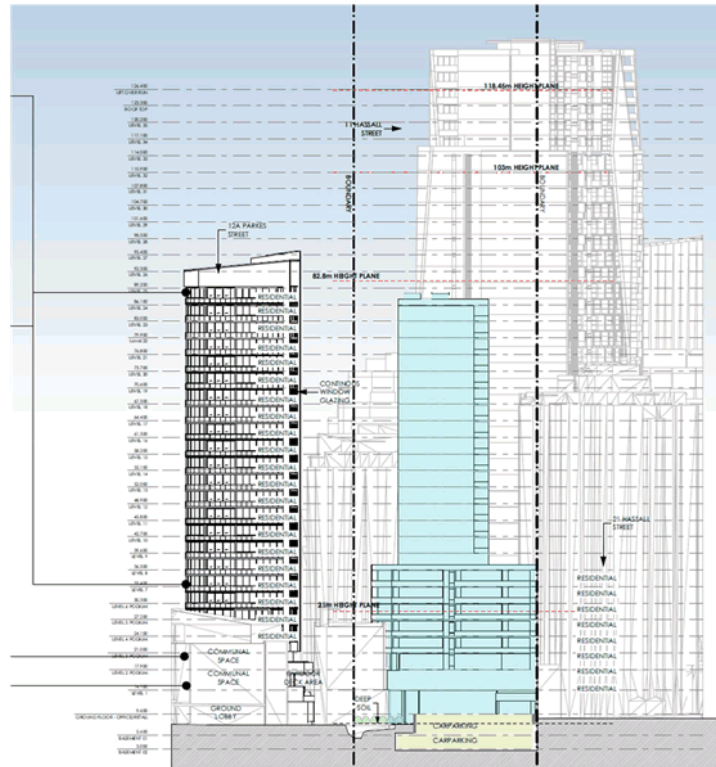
Building Achieved under Existing Height Controls (Source: PTI Architecture on behalf of applicant)
